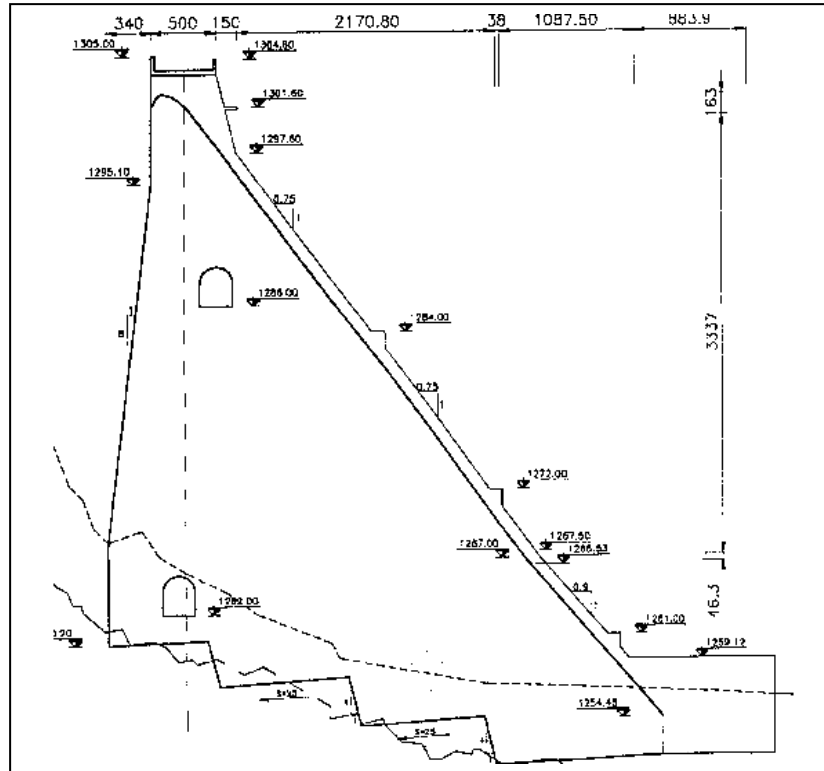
Central Cross Section of ZAVIN Dam [8]
